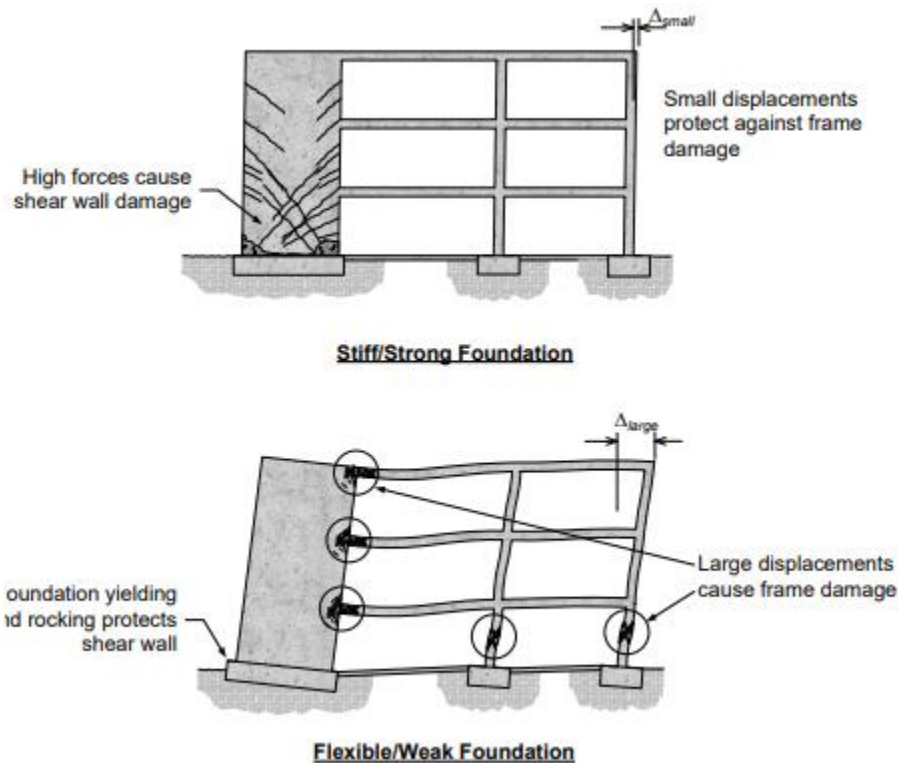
6 The significant impact of soil flexibility on a reinforced concrete shear wall system (ATC, 1996).
